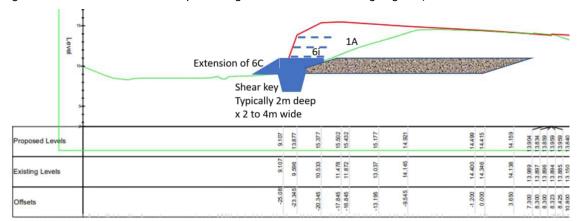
Section at Ch.4300. Proposed alignment in red and existing in green)
